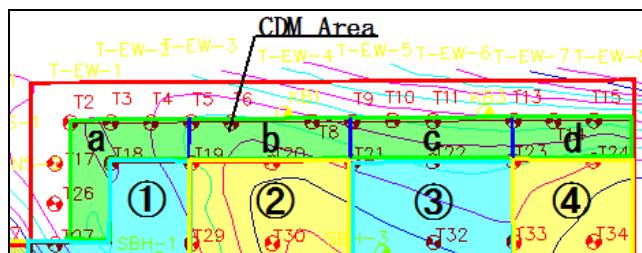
Plan of Examination Block for Earth Retaining Wall
